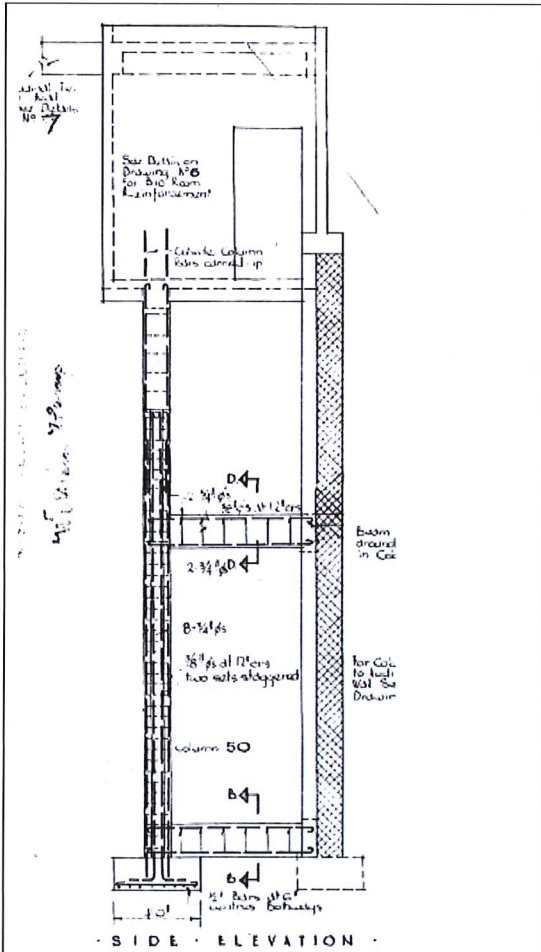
Elevation of the projector room, showing the heavy concrete 'box' supported on the URM wall at the rear and on concrete columns at the front.
